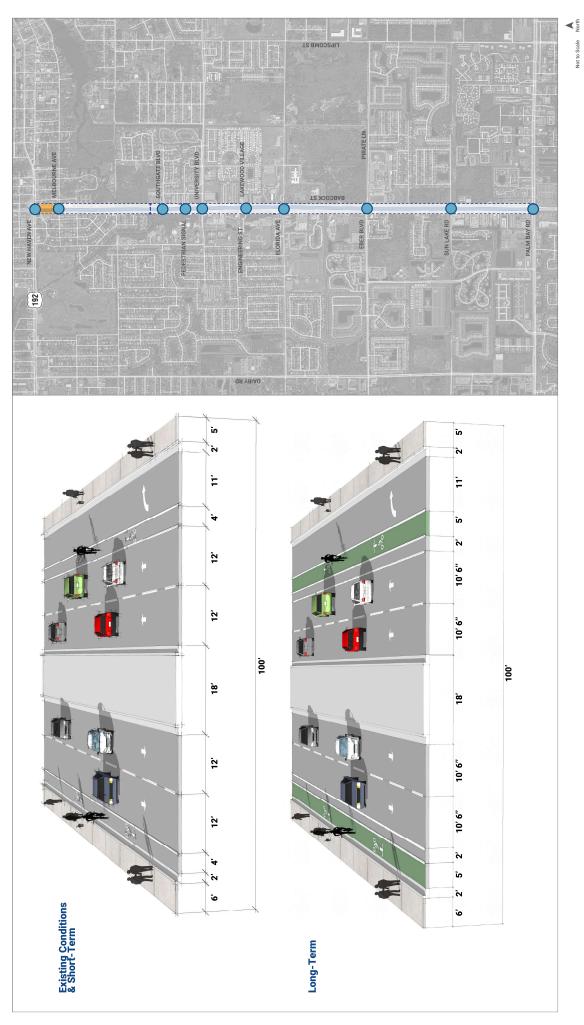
| Melbourne Avenue to New Haven Avenue Typical Section
